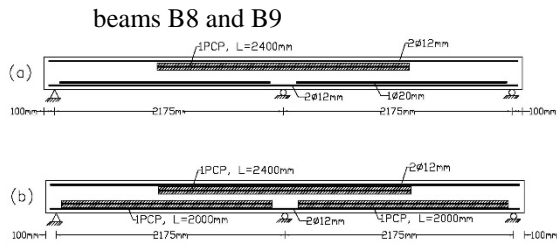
Beams reinforcement details: (a) B4, B5, B6 & B7; (b) B8 & B9
